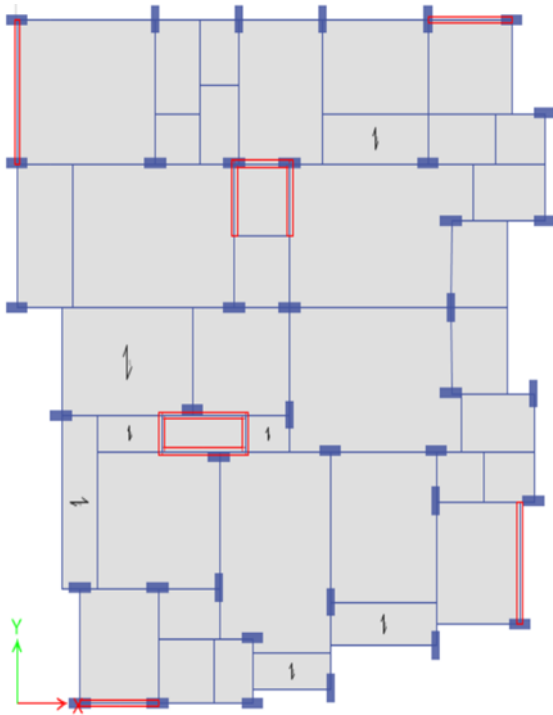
Plan of building with shear wall at Corners- FireDuct-Lift
